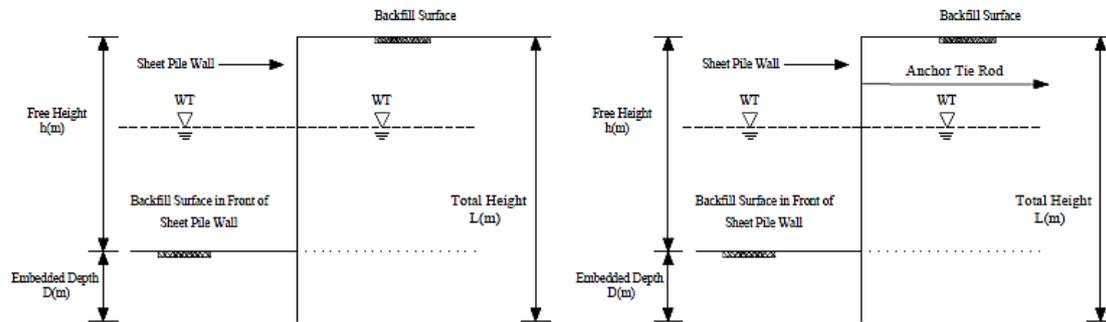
Typical wall section of (a) cantilever and (b) single anchored sheet piles used in the analysis.
